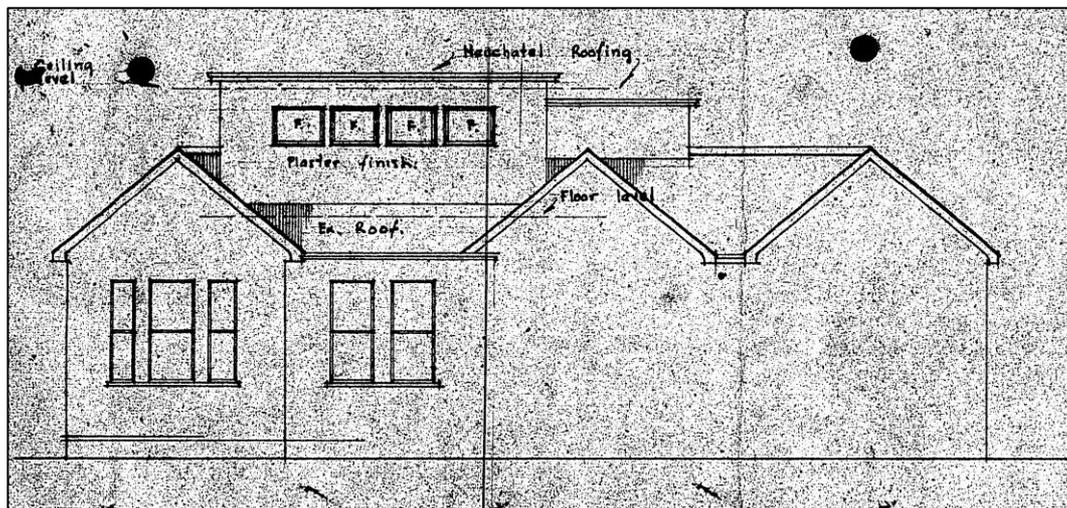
1951 Proposed addition, south elevation (Building Plans, DCC Archives).
